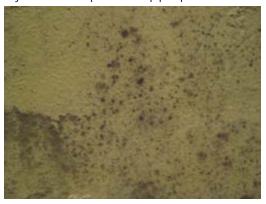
Suspect mold is located on a plaster wall in the basement storage area.
